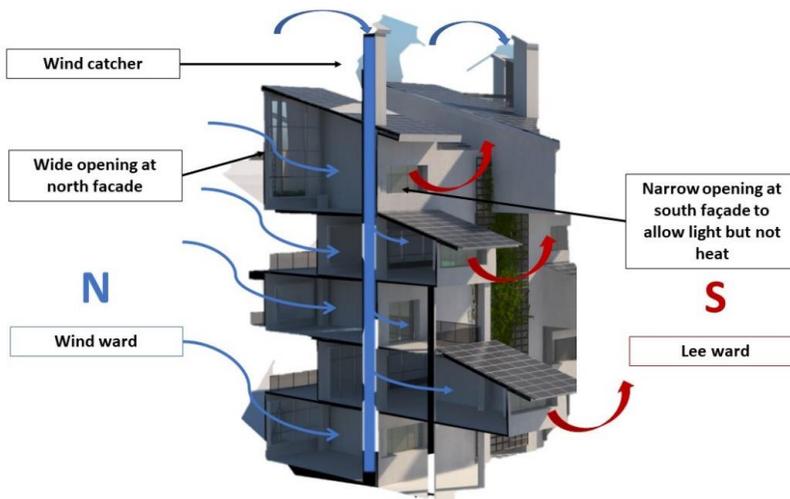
Section shows the ventilation flow in the proposed office building design,
